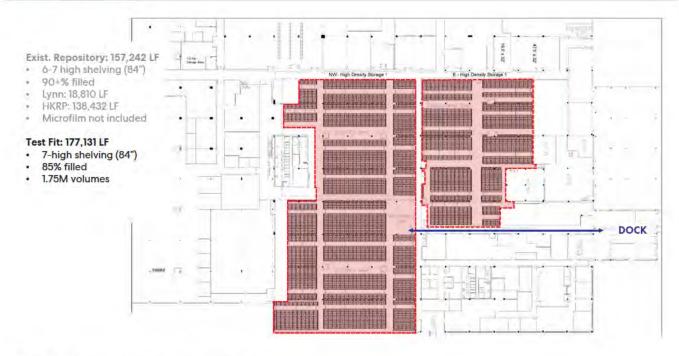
Collections storage test fit for 2550 Northwestern Ave.
